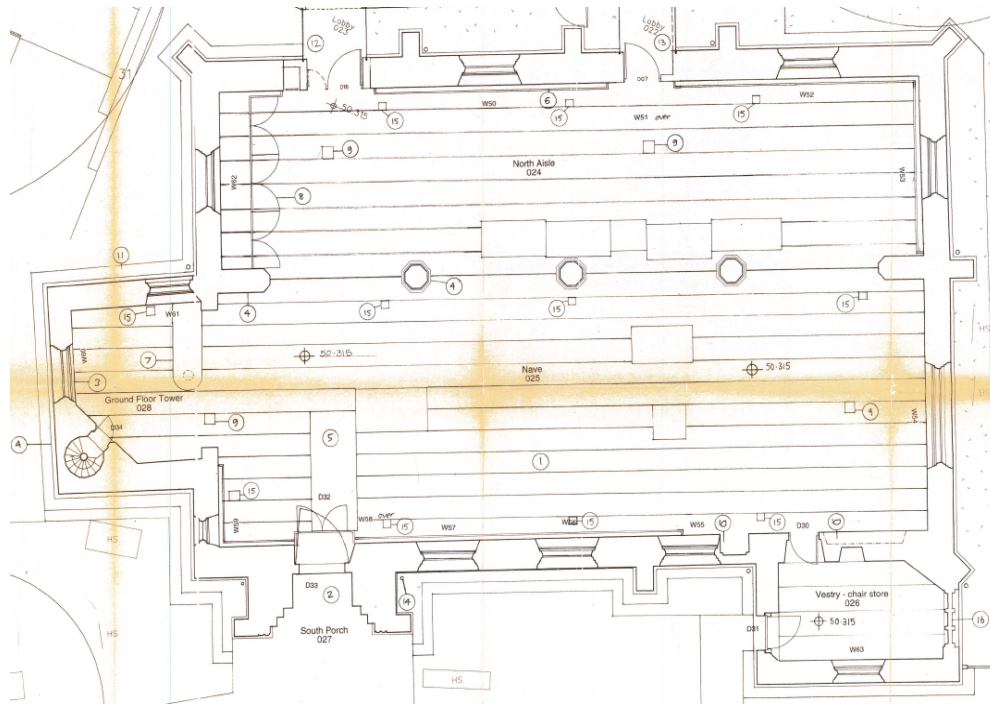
Ground Floor Plan of St. Margaret's Church as proposed [187].
